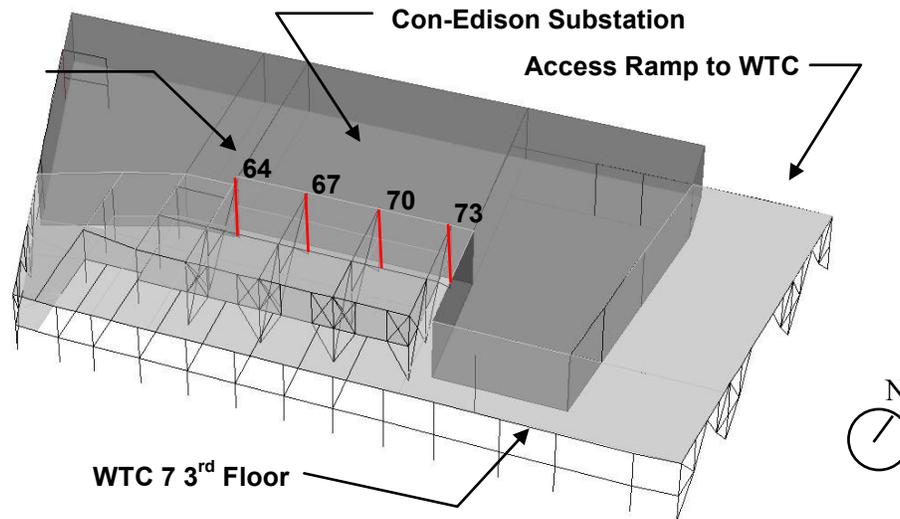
Con Ed substation location relative to the WTC 7 building.
